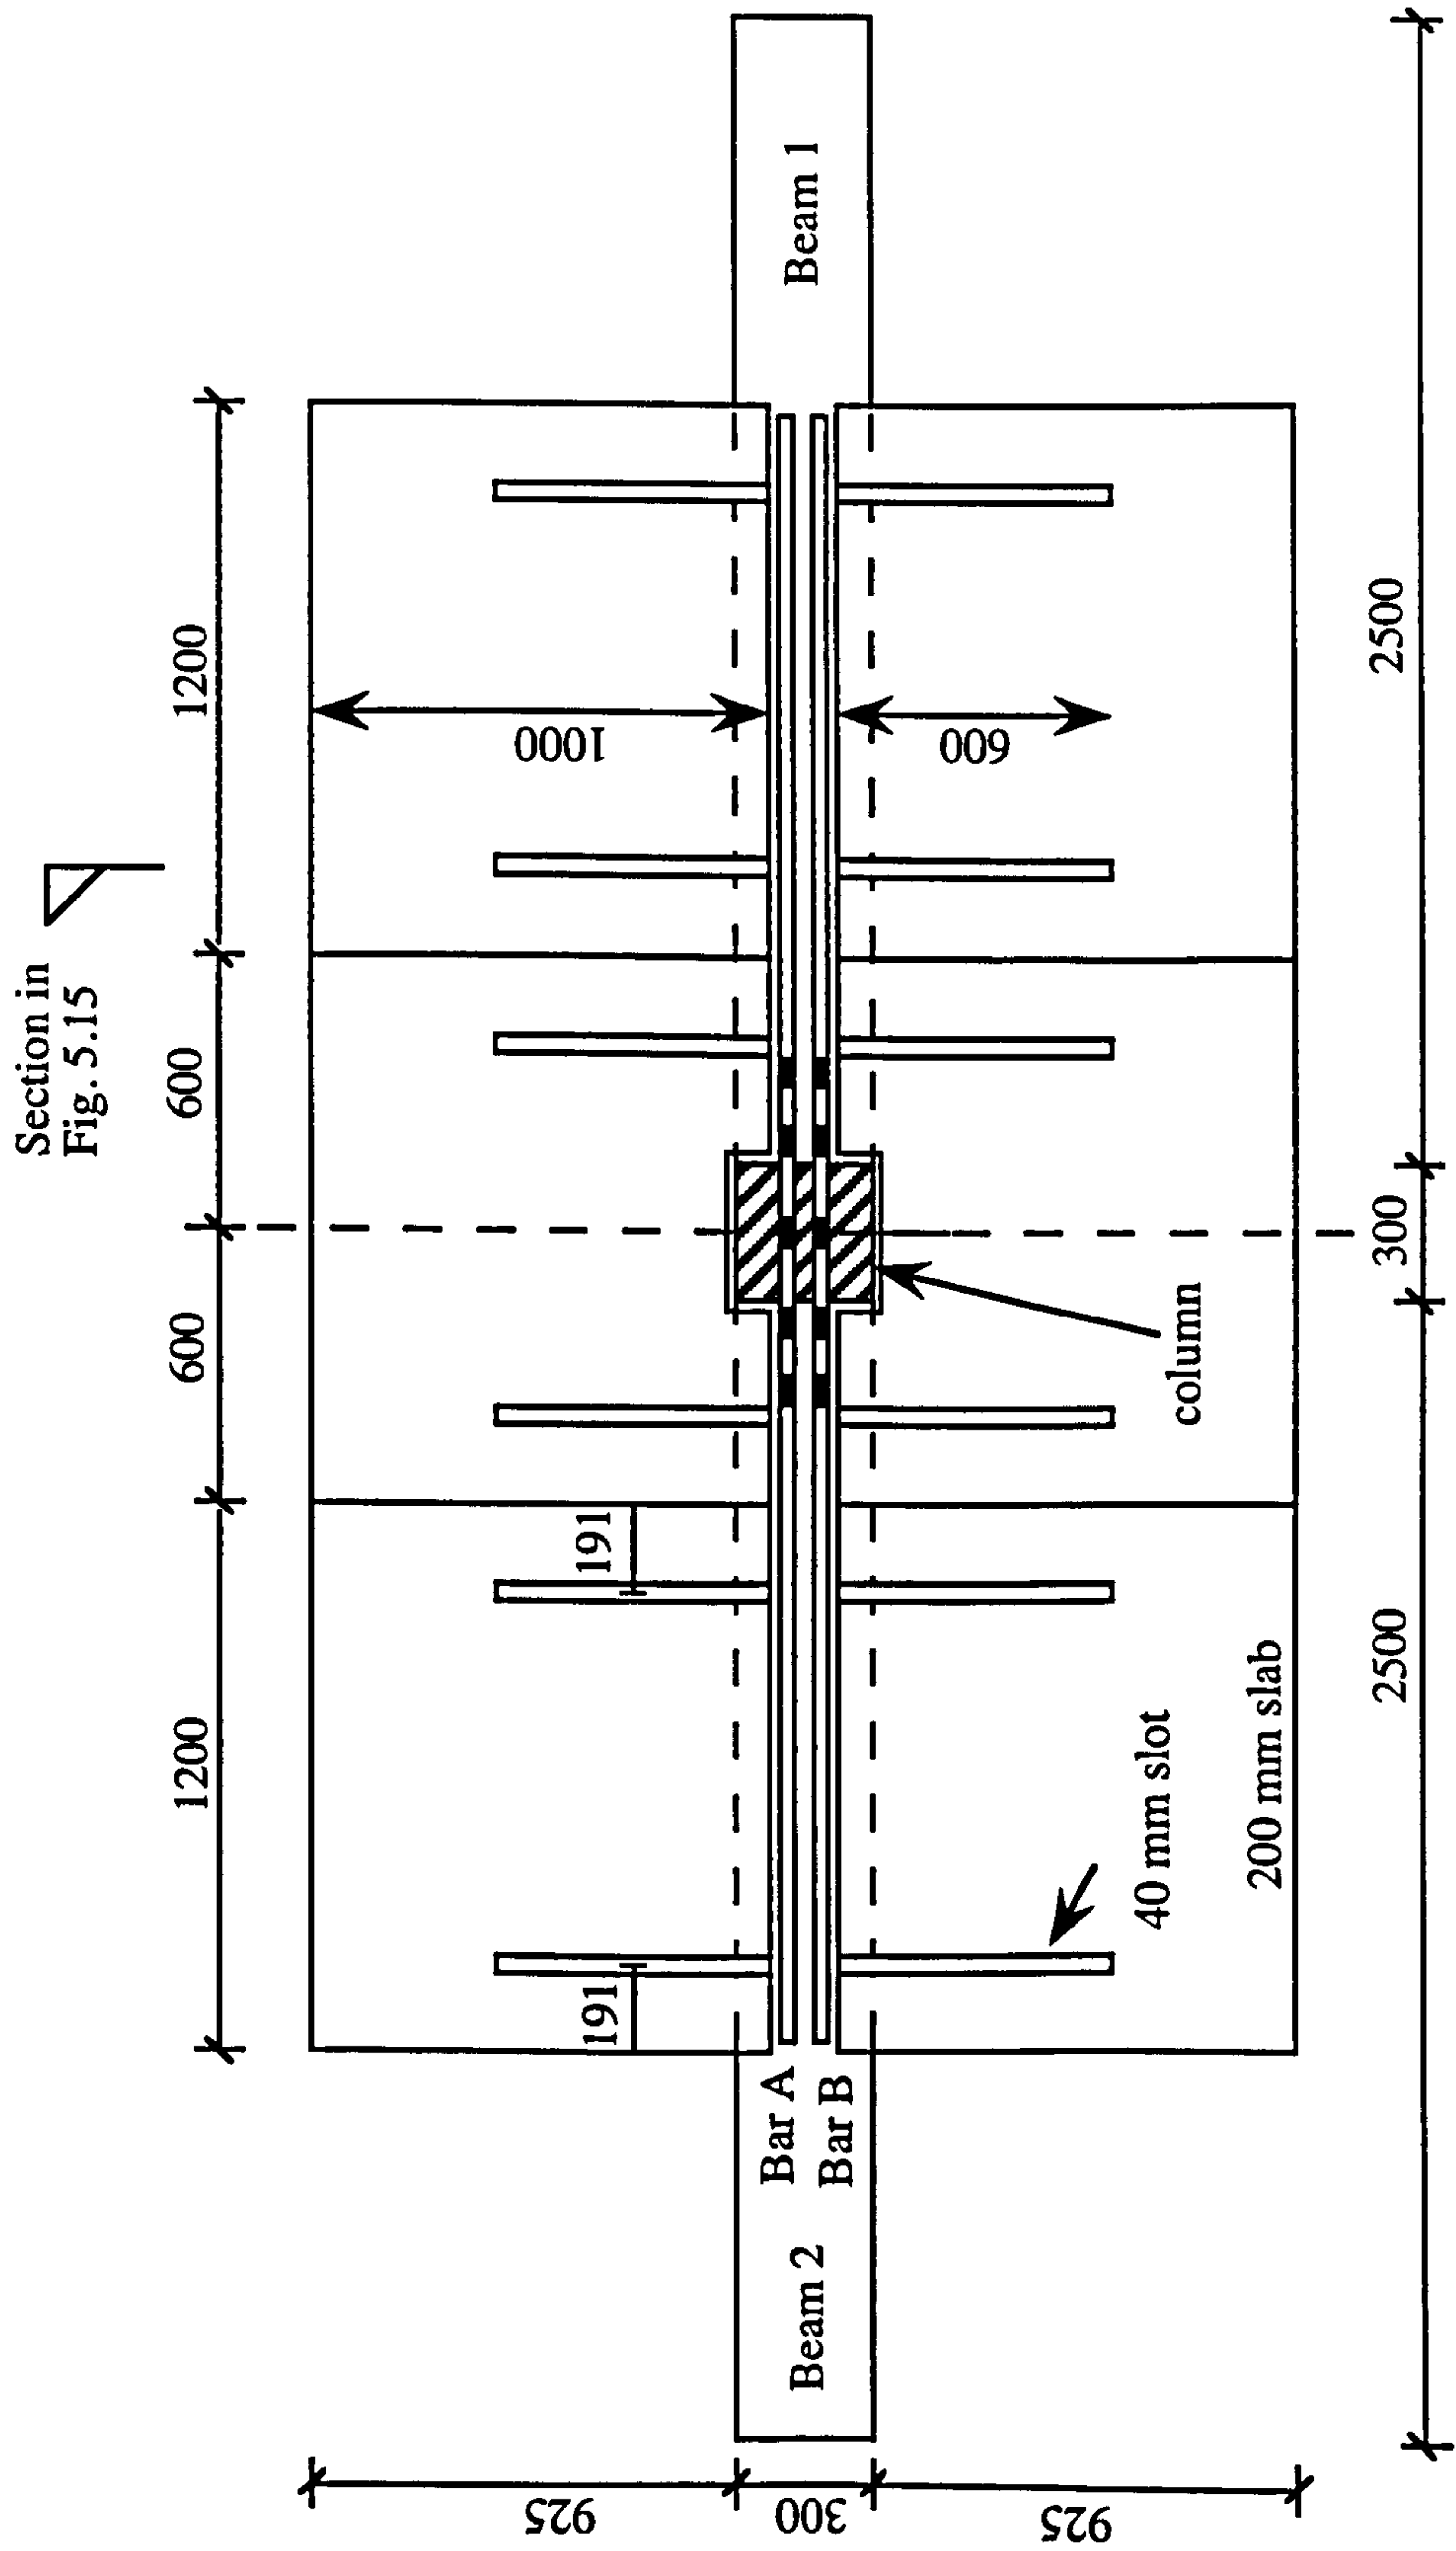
(b): Plan view of subframe SF1 with floor slabs
